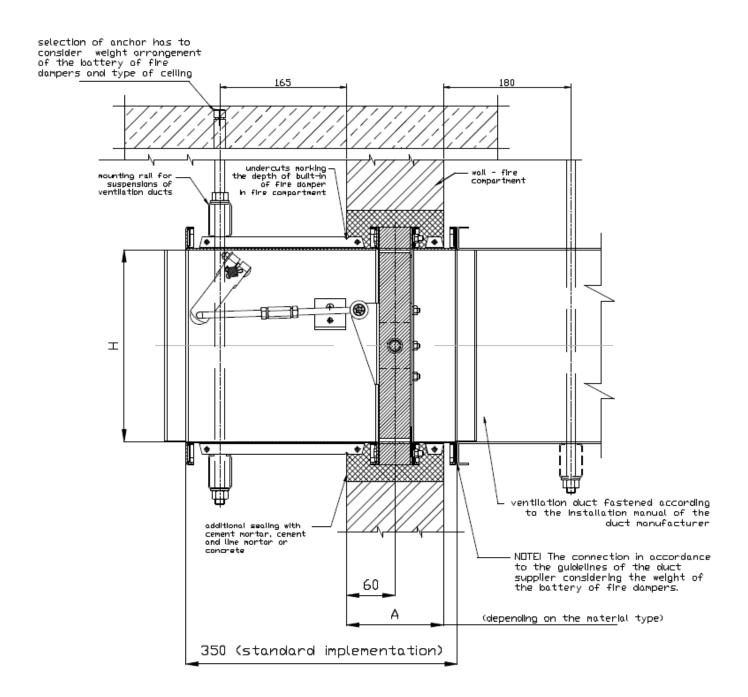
Installation of a battery consisting of two fire dampers KWP in horizontal arrangement in rigid compartment – side view.
